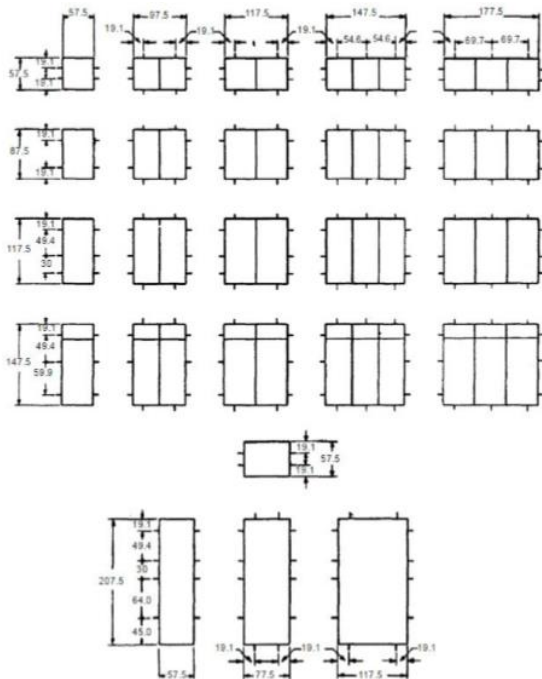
Chart Showing Approximate Position of Fixing Holes and Number of Fixing Lugs
